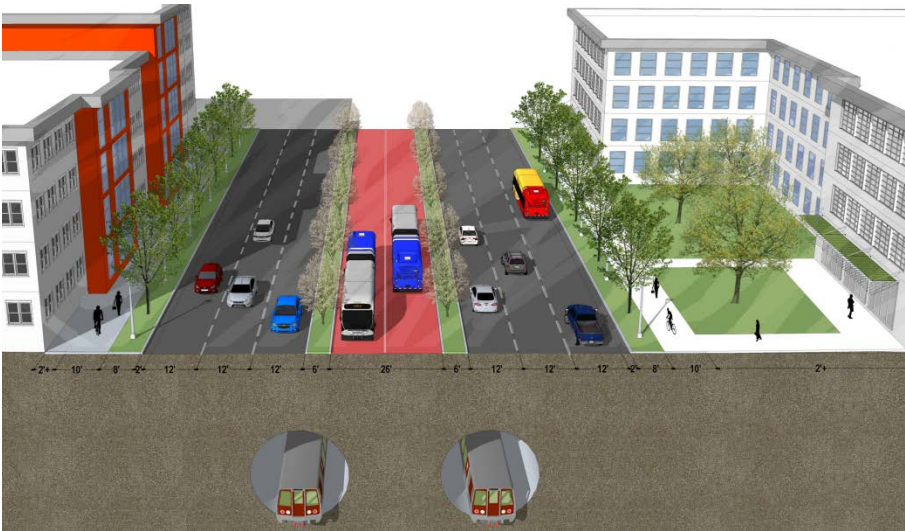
Alternative 4: Metrorail/BRT Hybrid – Median, Typical Section (Hybla Valley to Woodbridge)
